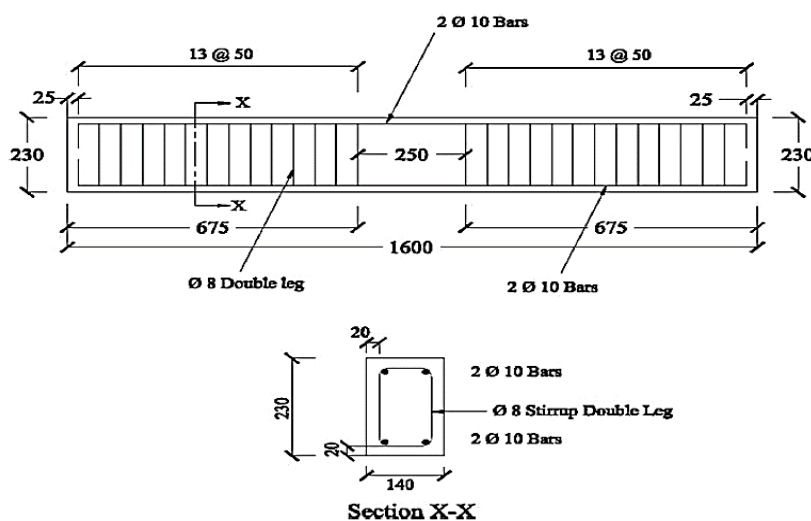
Cross sectional dimensions of the concrete beam specimen (Al-Osta et al. 2017).
